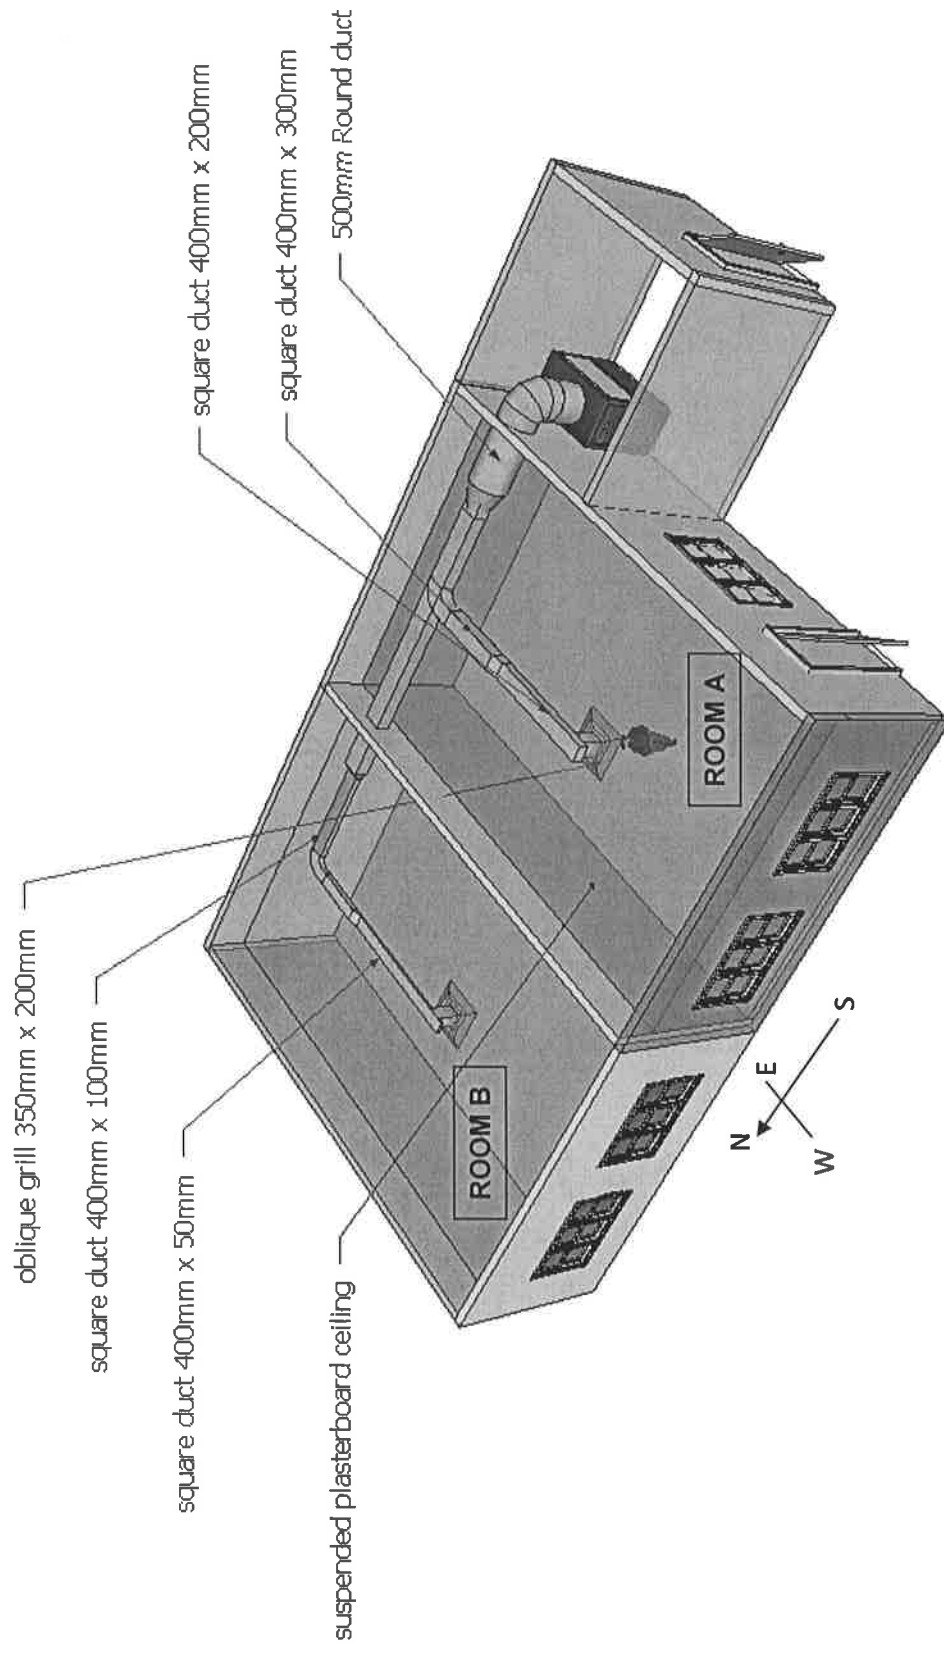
(b): Perspective view (detail dimensions for all ductings)
